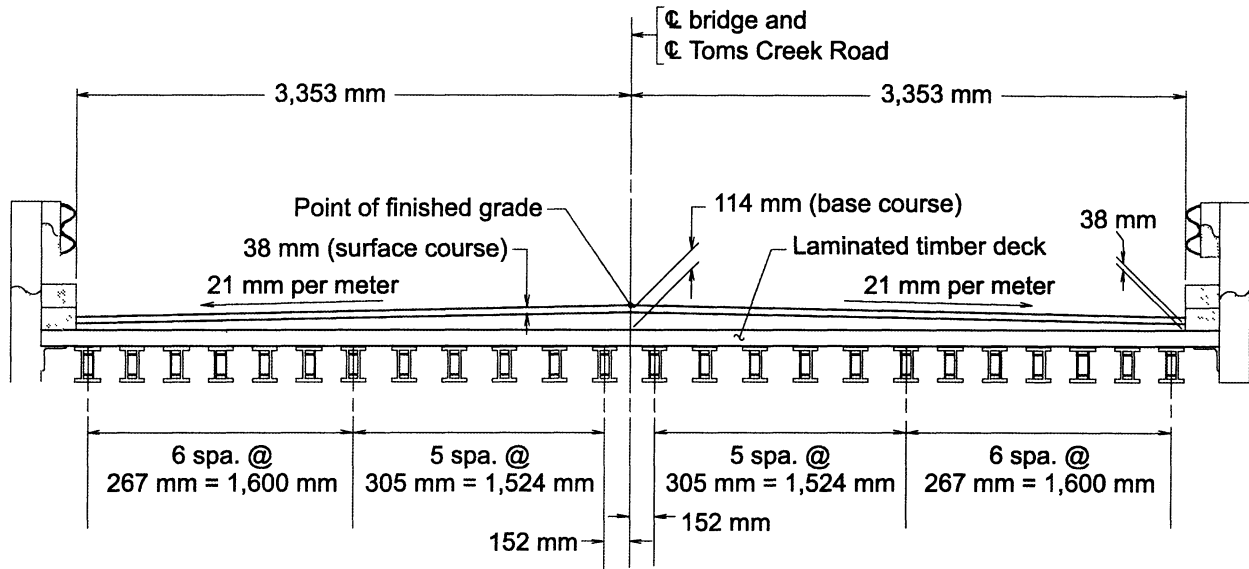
Transverse view from design plans for rehabilitated bridge structure showing placement of composite beams (*Proposed 1997*).
